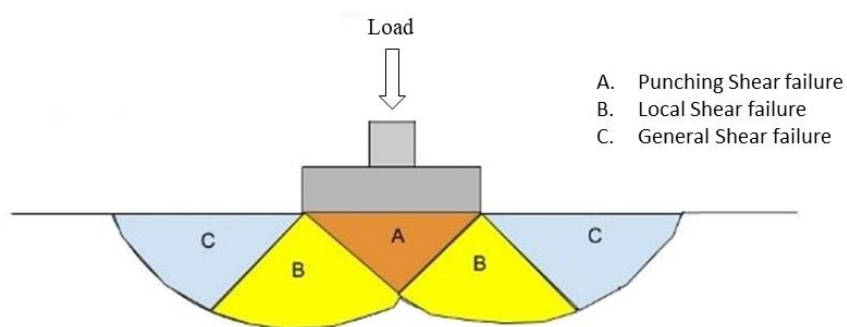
Different modes of failure upon excessive loading (representation of Terzagui's failure zones underneath a shallow foundation)
